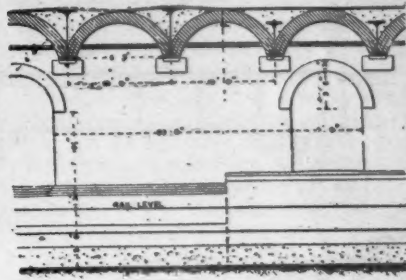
LONGITUDINAL SECTION OF COVERED WAY FOR CENTRAL STATION.
